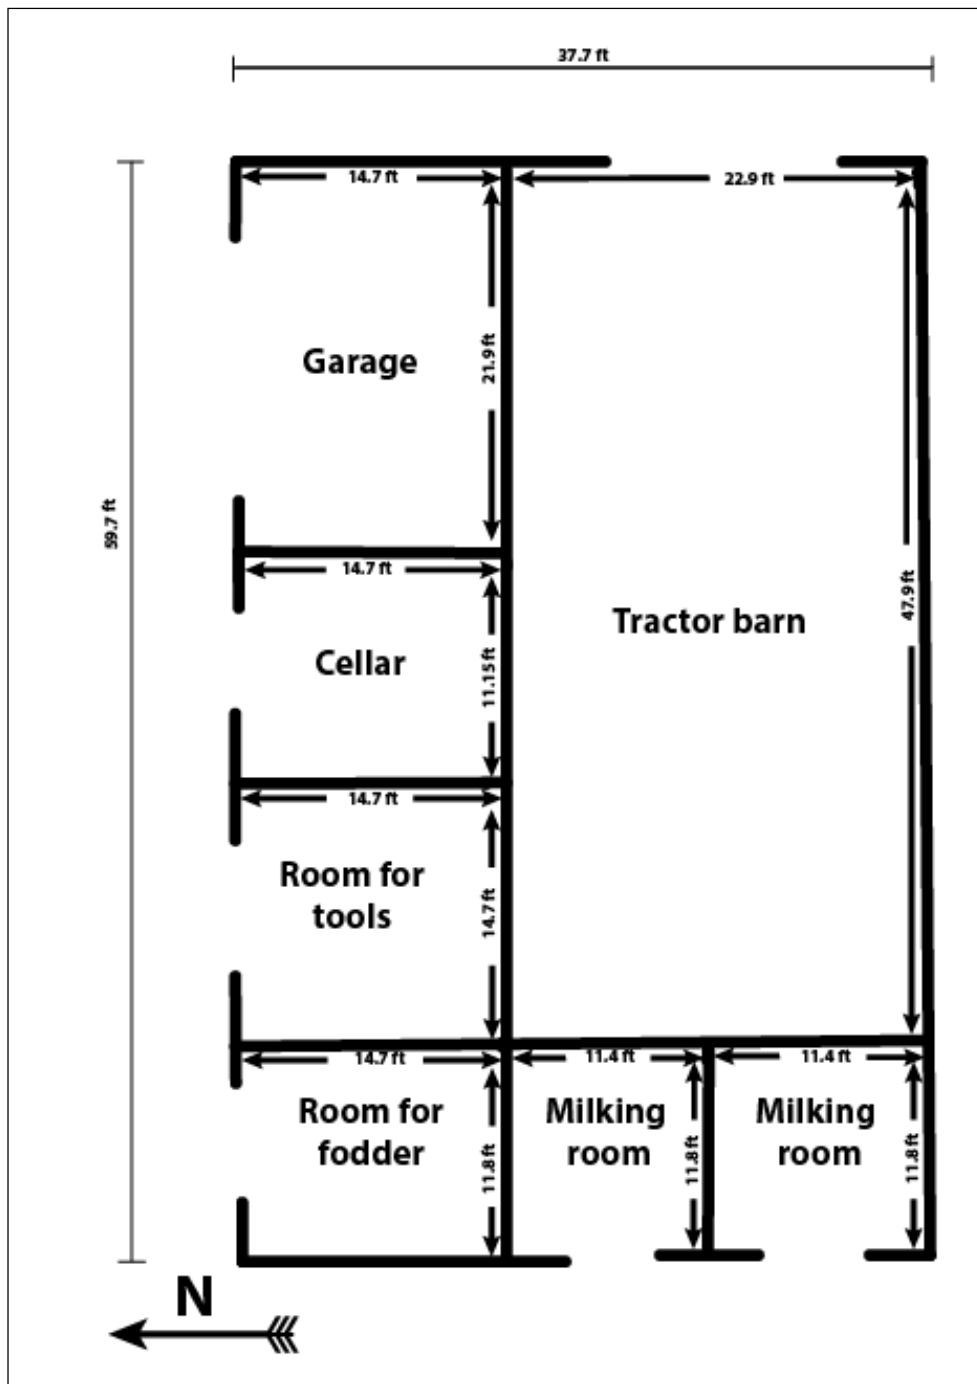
A reconstructed floor plan of an 20th century outer building 10 metres to the south-west of the main house in Figure 48 (Breytenbach, 2017).
